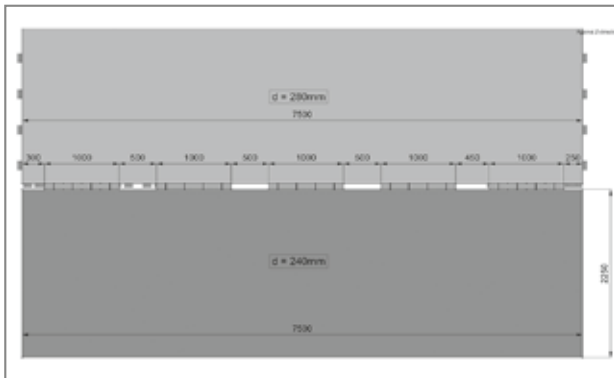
Schöck Isokorb® T type K-E, K-T: Geometry of the interior floor slab and balcony
